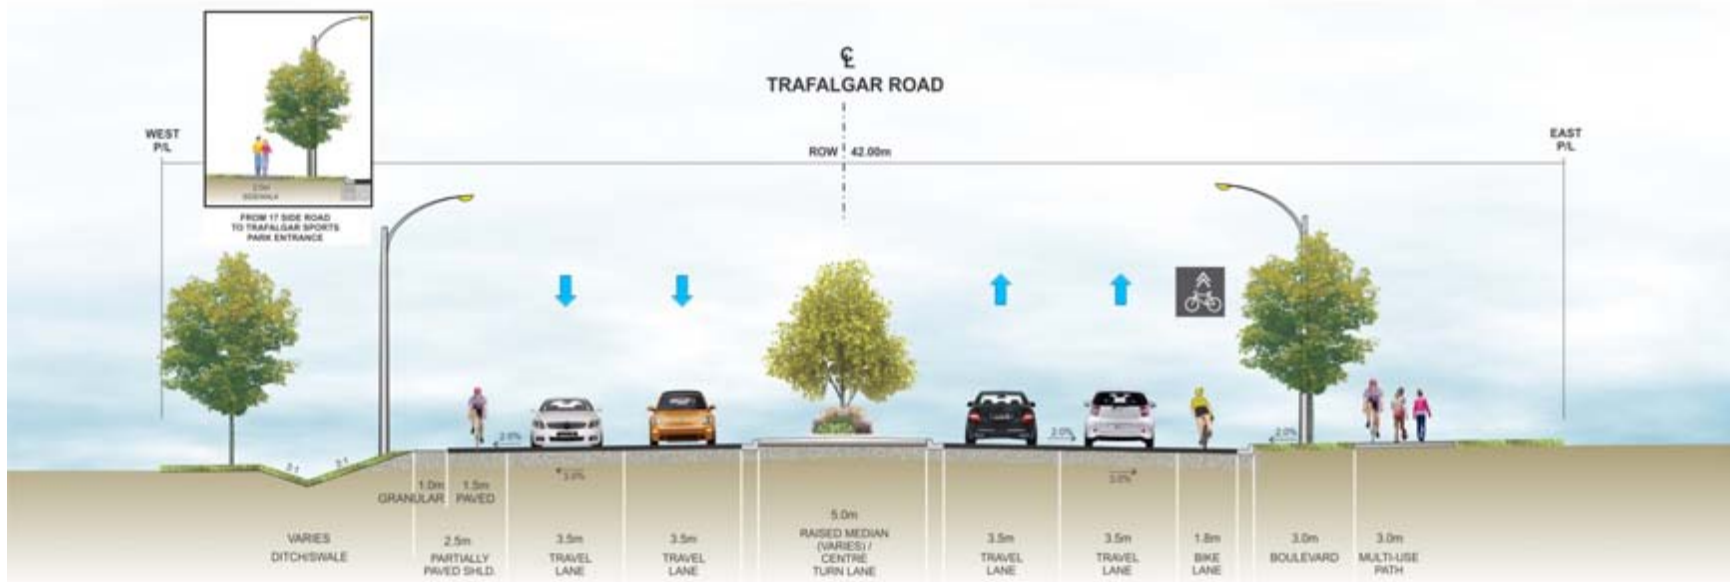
Trafalgar Road Proposed Typical Cross Section – 17 Side Road to Highway 7
